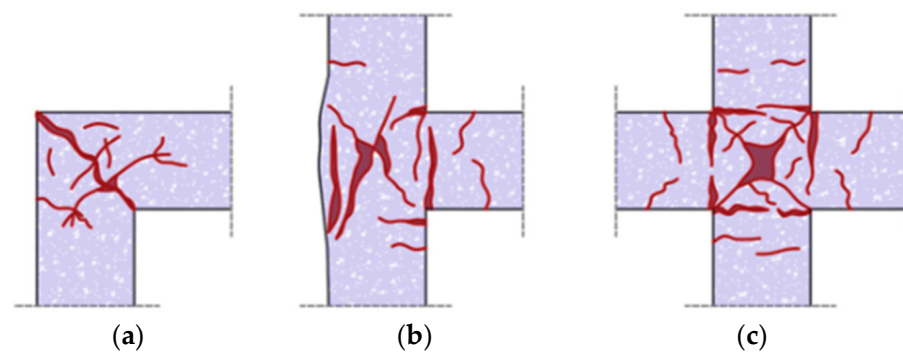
Failure mechanism of cyclic seismic load under column–beam joint: (a) corner joint, (b) exterior joint, and (c) interior joint [55].
